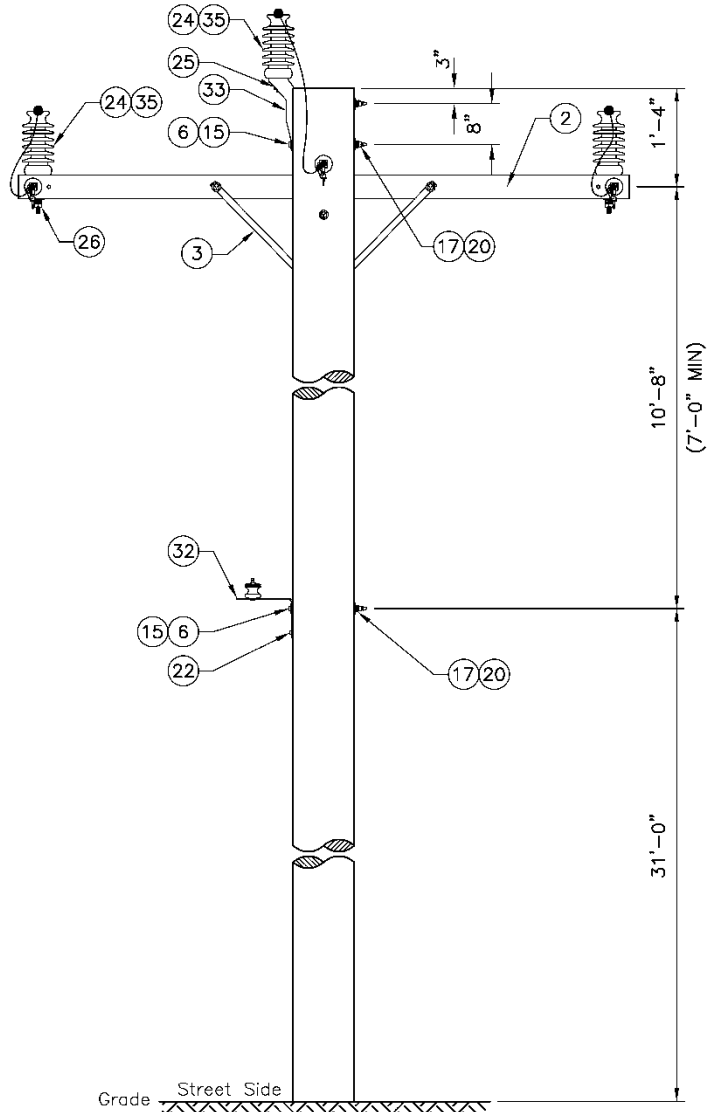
Three-Phase 397.5 and 954 kcmil ACSR Single Deadend Pole Top Assembly, Top View
